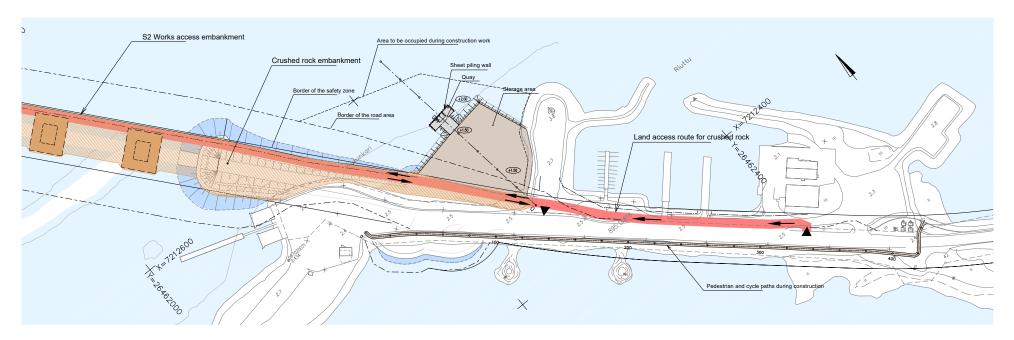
Traffic arrangements at the construction site in Riutunkari.
